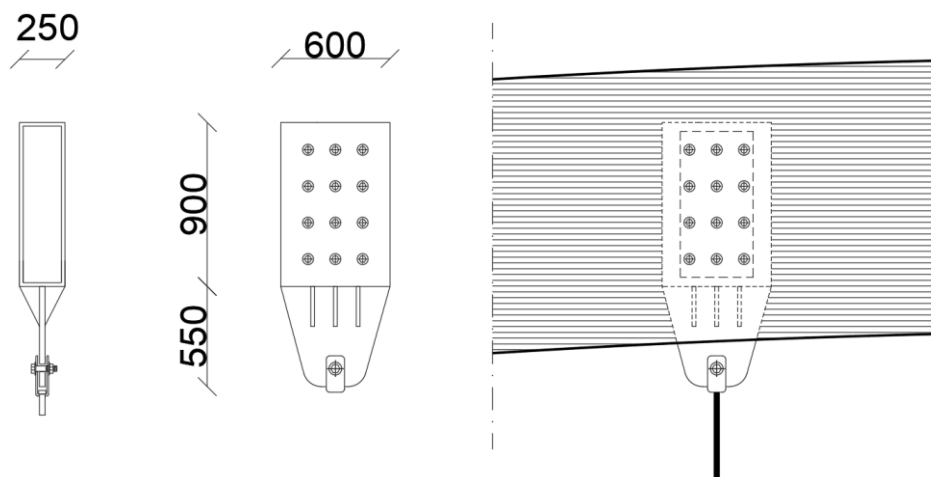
Connection Design Proposal – Vertical Hangers to Structural Arches
